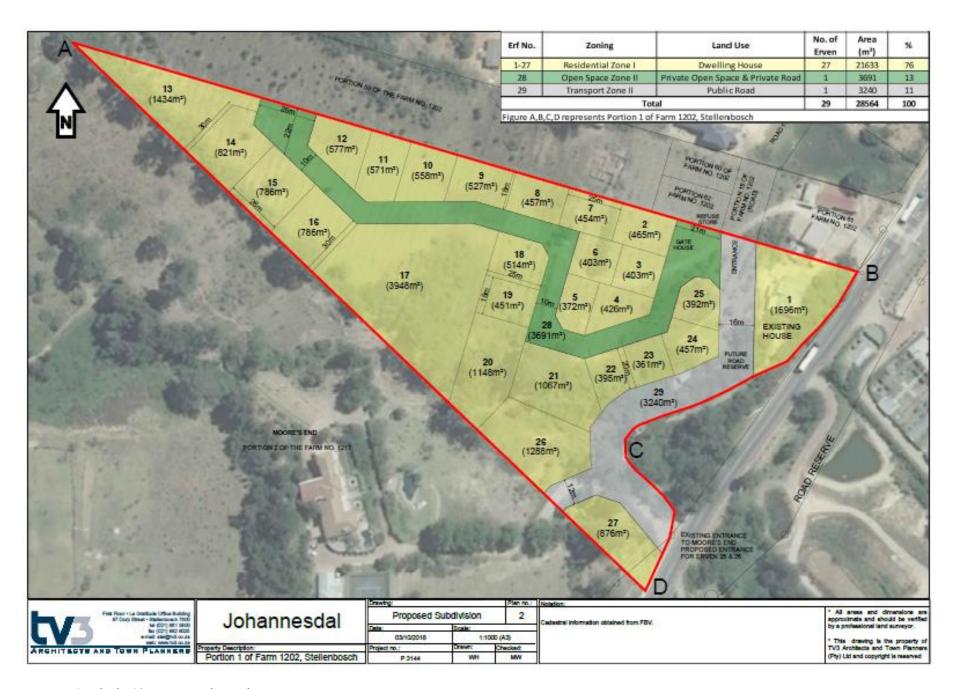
(previous page): Plan of the proposed subdivision with 27 residential erven.
